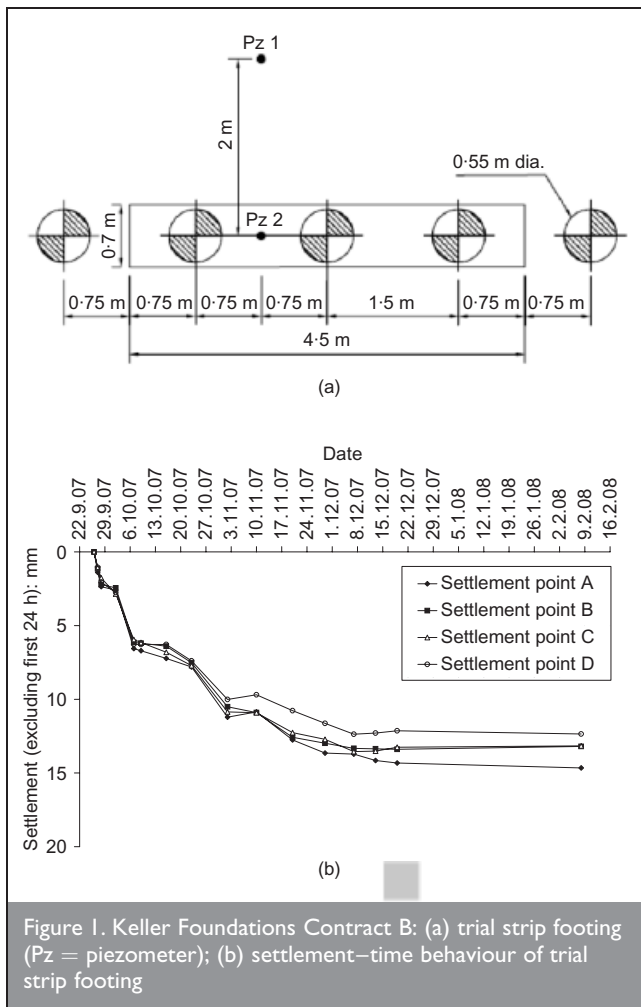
Keller Foundations Contract B: (a) trial strip footing (Pz = piezometer); (b) settlement–time behaviour of trial strip footing
